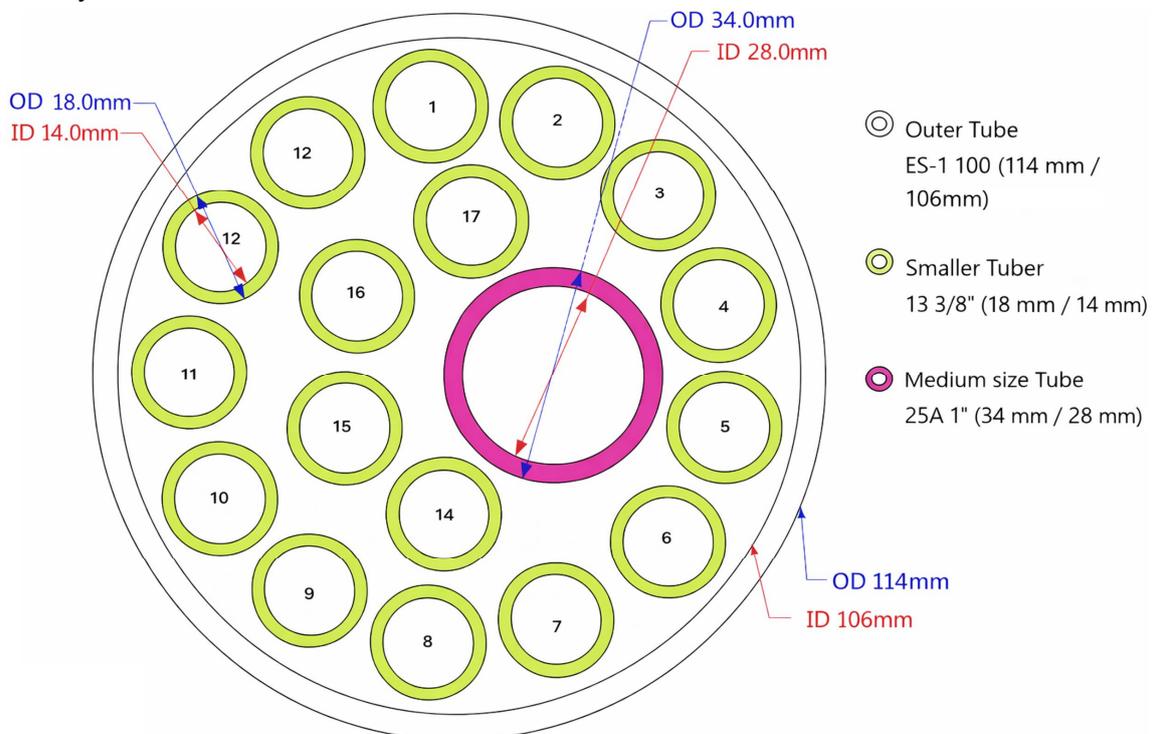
the PVC piezometer pipes arrangement for the MDS in Taiwan
